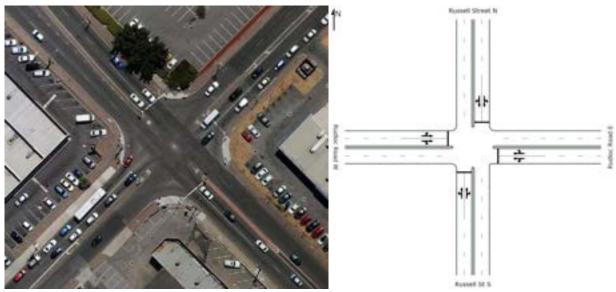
Russell Street/Rudloc Road Intersection – Existing Geometry
